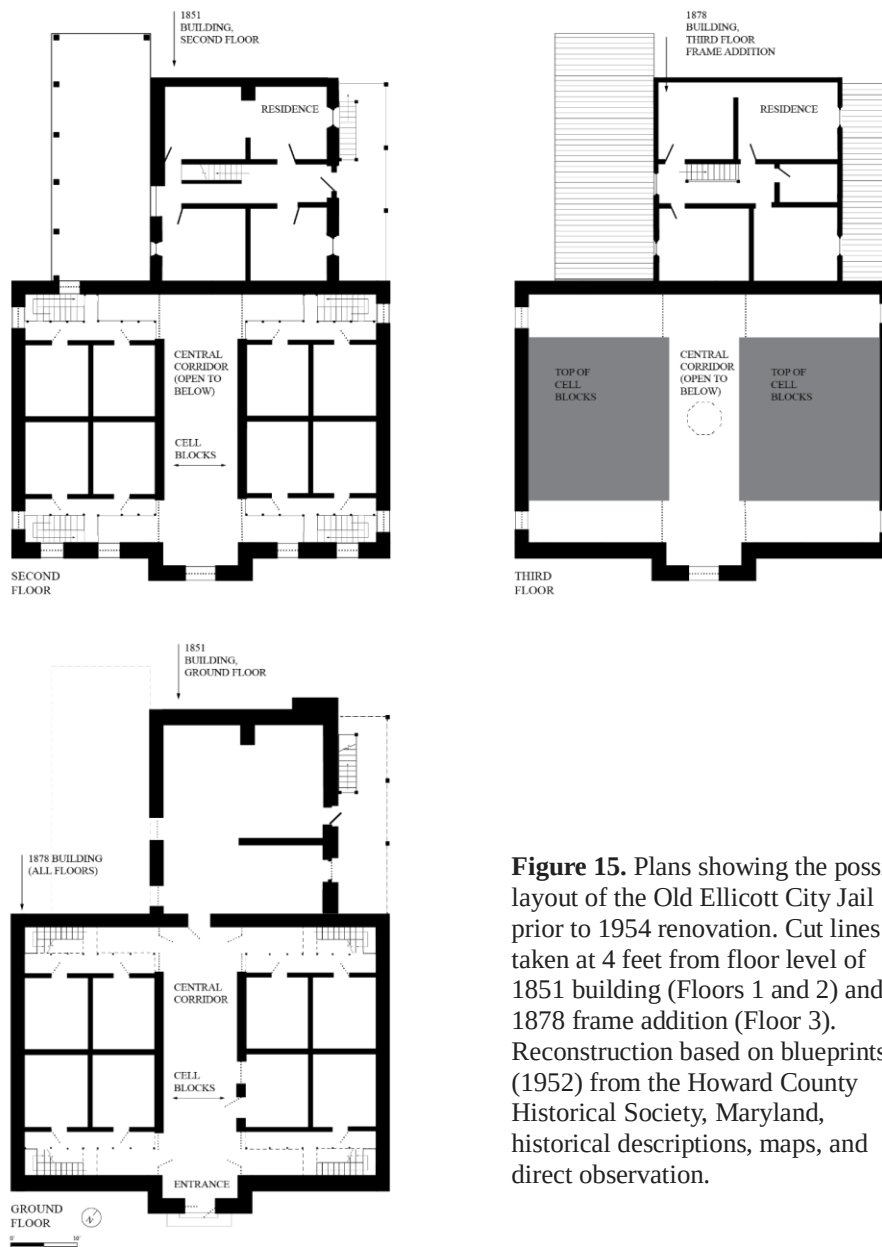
Plans showing the possible layout of the Old Ellicott City Jail prior to 1954 renovation. Cut lines taken at 4 feet from floor level of 1851 building (Floors 1 and 2) and 1878 frame addition (Floor 3). Reconstruction based on blueprints (1952) from the Howard County Historical Society, Maryland, historical descriptions, maps, and direct observation.
